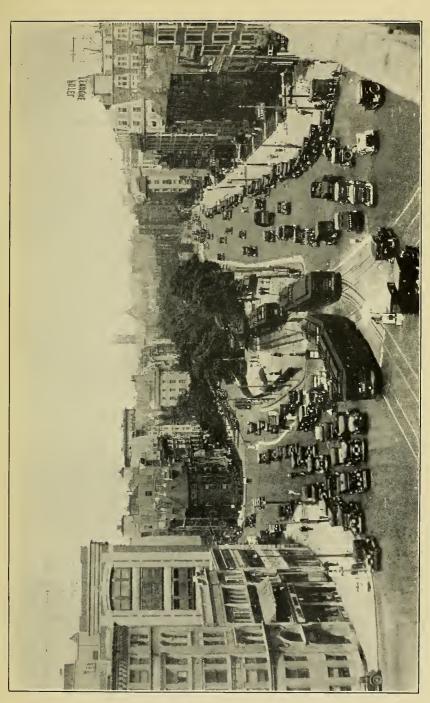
PLATE II.—GENERAL VIEW OF GOVERNOR SQUARE, TAKEN JUST PRIOR TO BEGINNING CONSTRUCTION OF SUBWAY EXTENSION.
